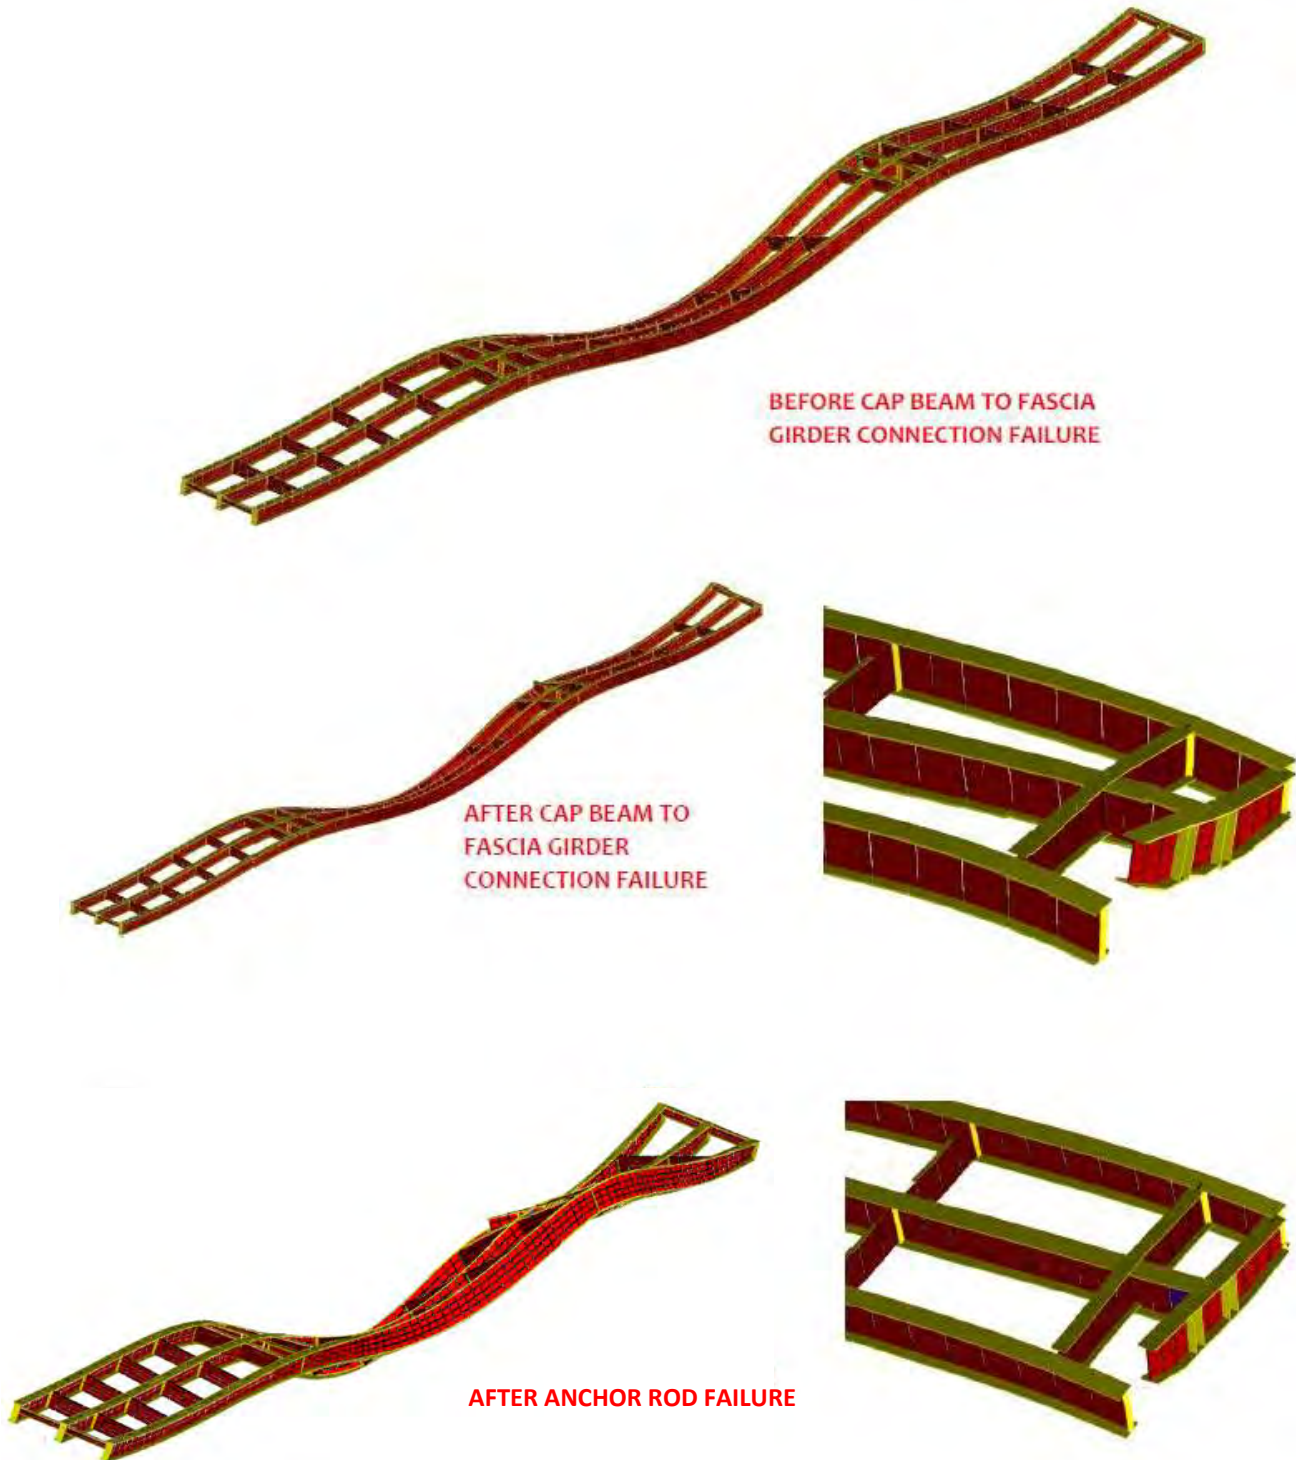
Progression of failures in structure at 3.33xHL-93 and 4.2xHL-93 loading (Deck not shown for clarity).
